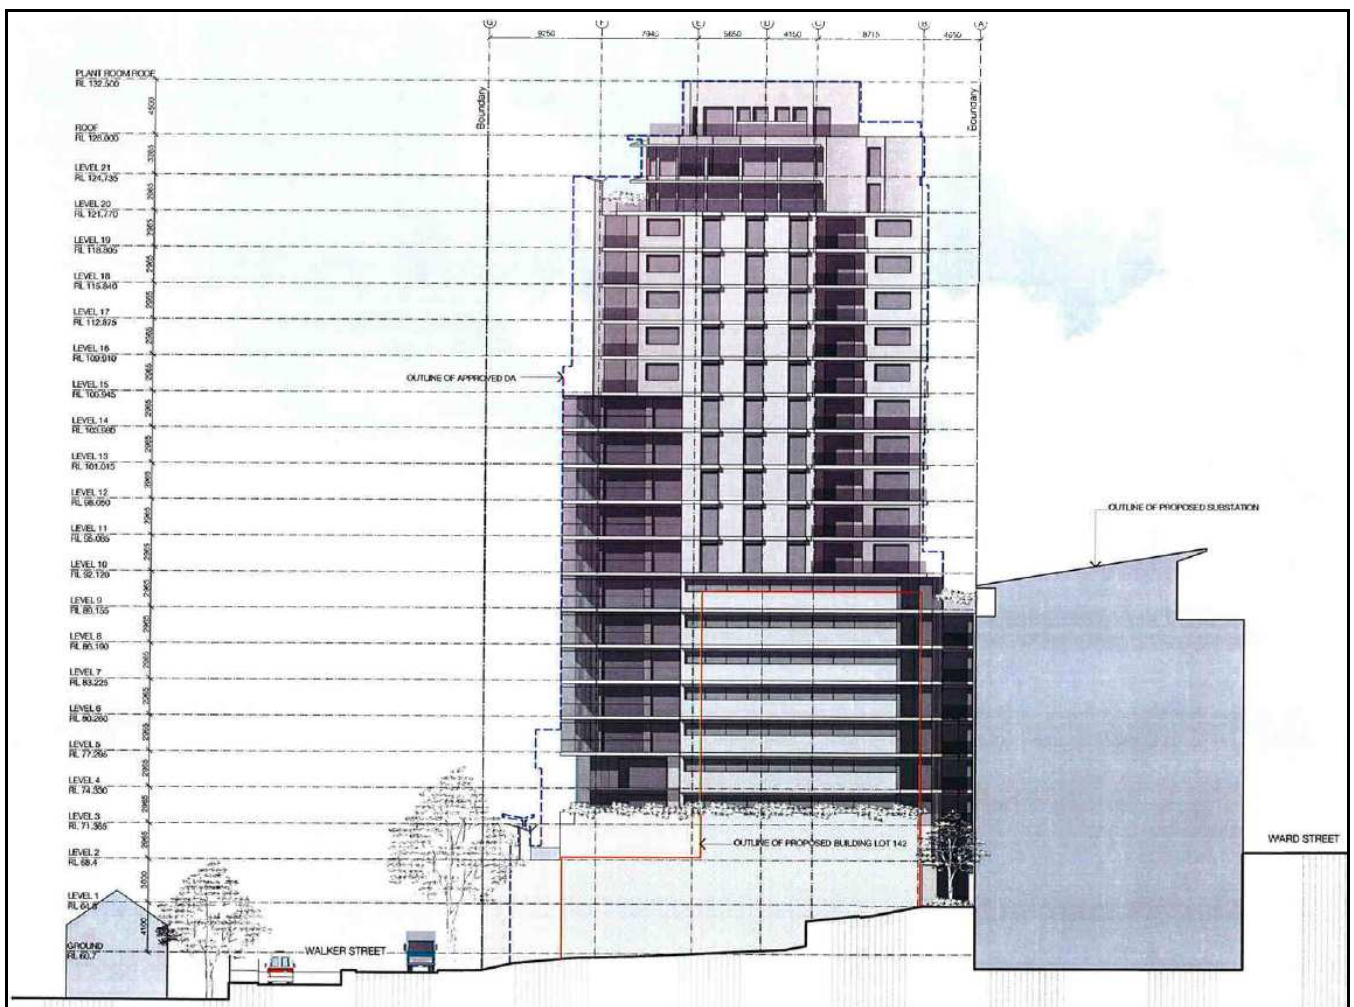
Elevation of Proposed Mixed use Commercial/Residential Development by Winten Property Group.
